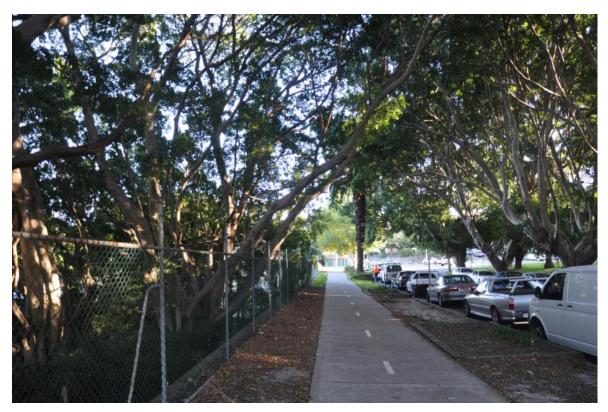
Wansey Road Stop. All trees are proposed to be removed to the left (western side of the Road). Refer EIS Figure 15.21b Randwick Precinct (South) – Impacts to planted trees
